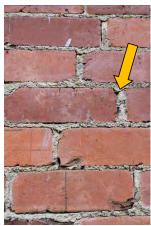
Typical poor wall bedding mortar which has not been struck for a fair-faced pointing finish.
